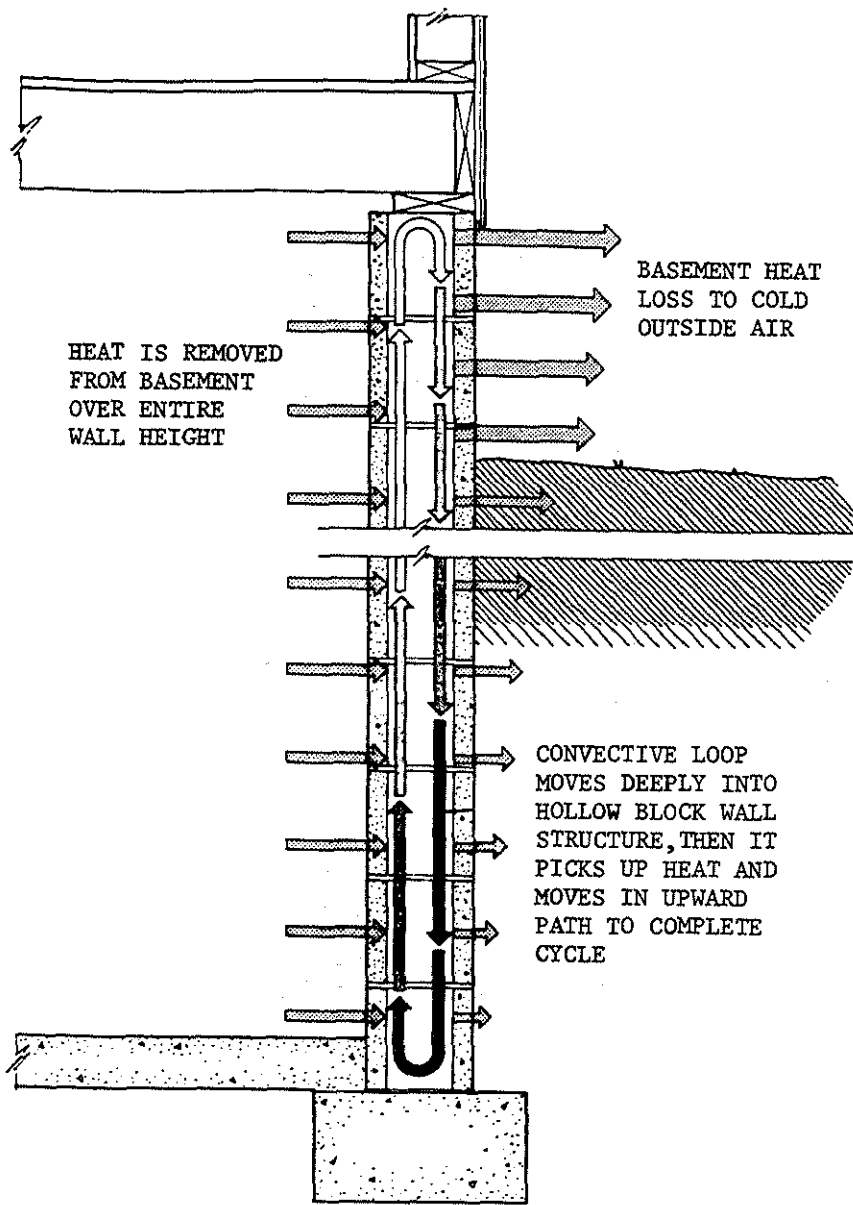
Basement masonry wall using hollow block construction which encourages convective loops
